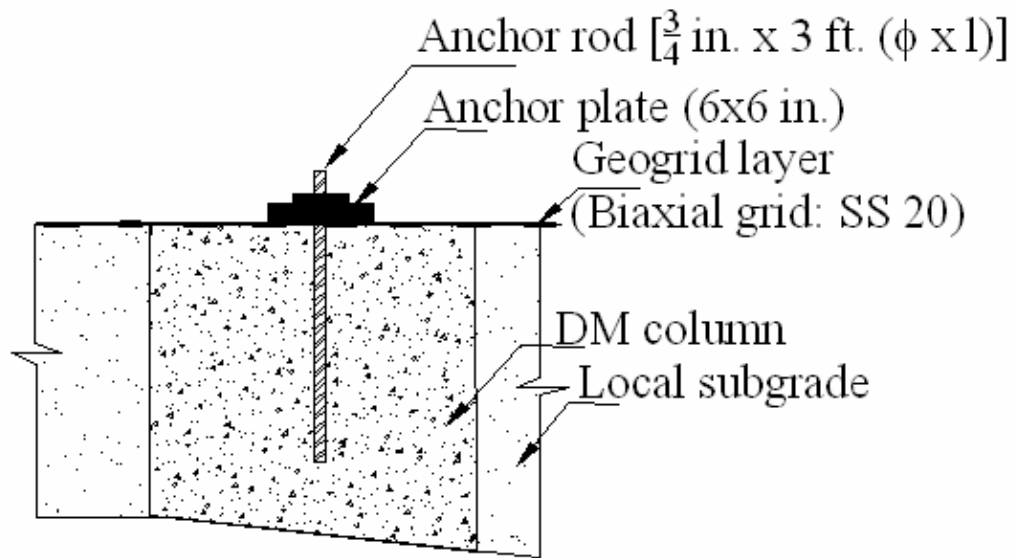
Details of anchor rod, plate and geogrid connection to the DSM column (Detail A).
